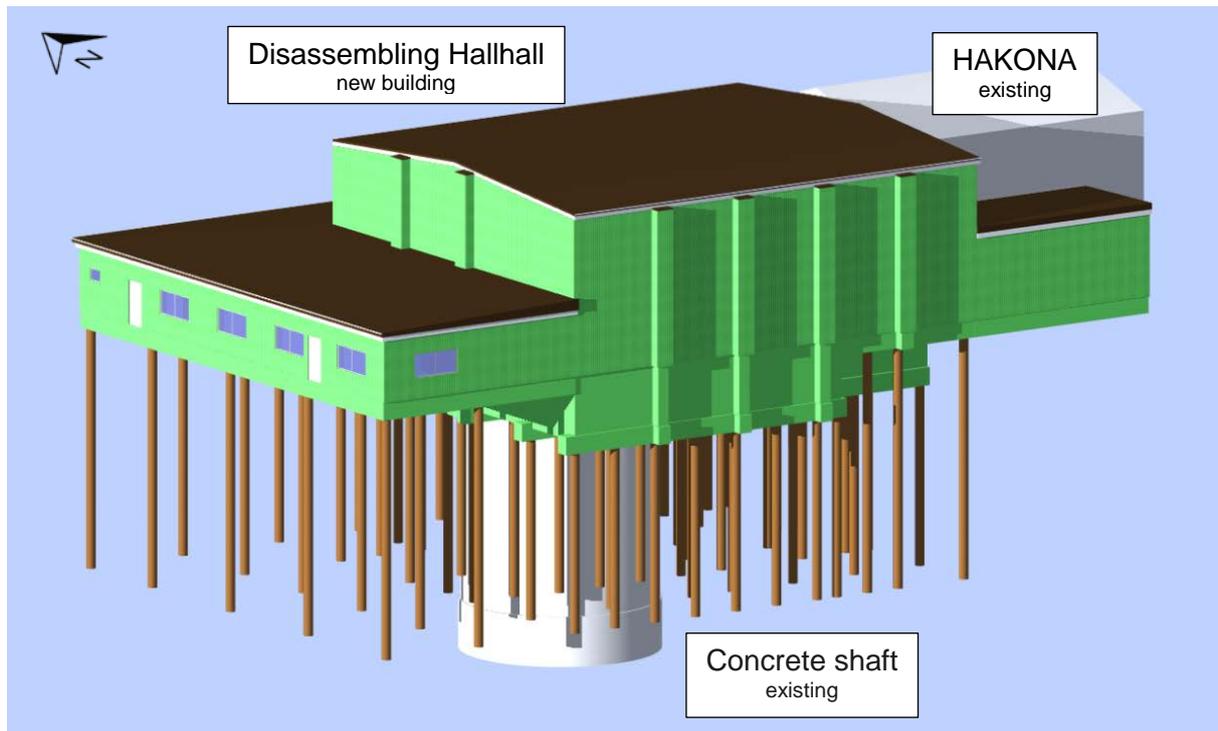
Isometric of Disassembling Hall (light green) and the concrete shaft
